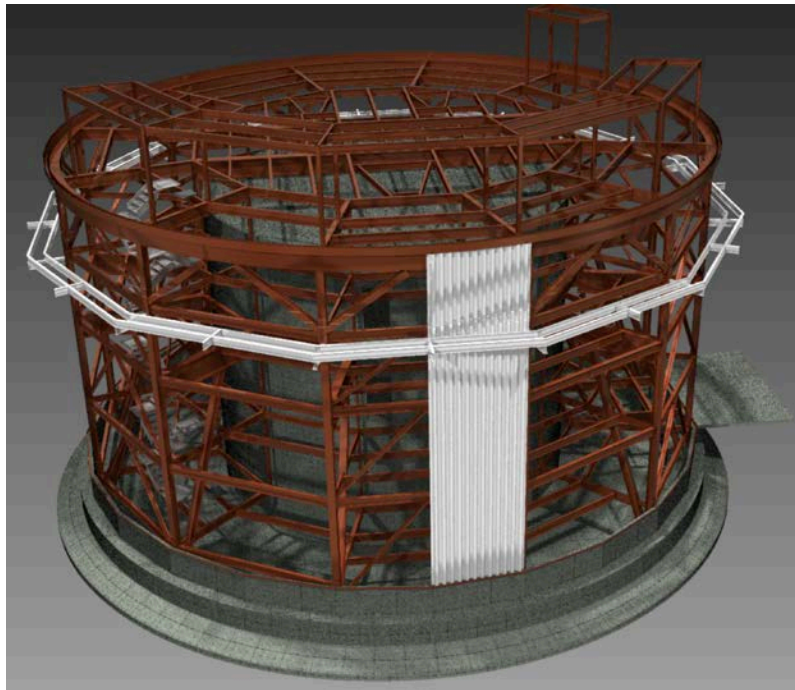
Model of the observatory, showing the outer building ring foundation and steel building structure
